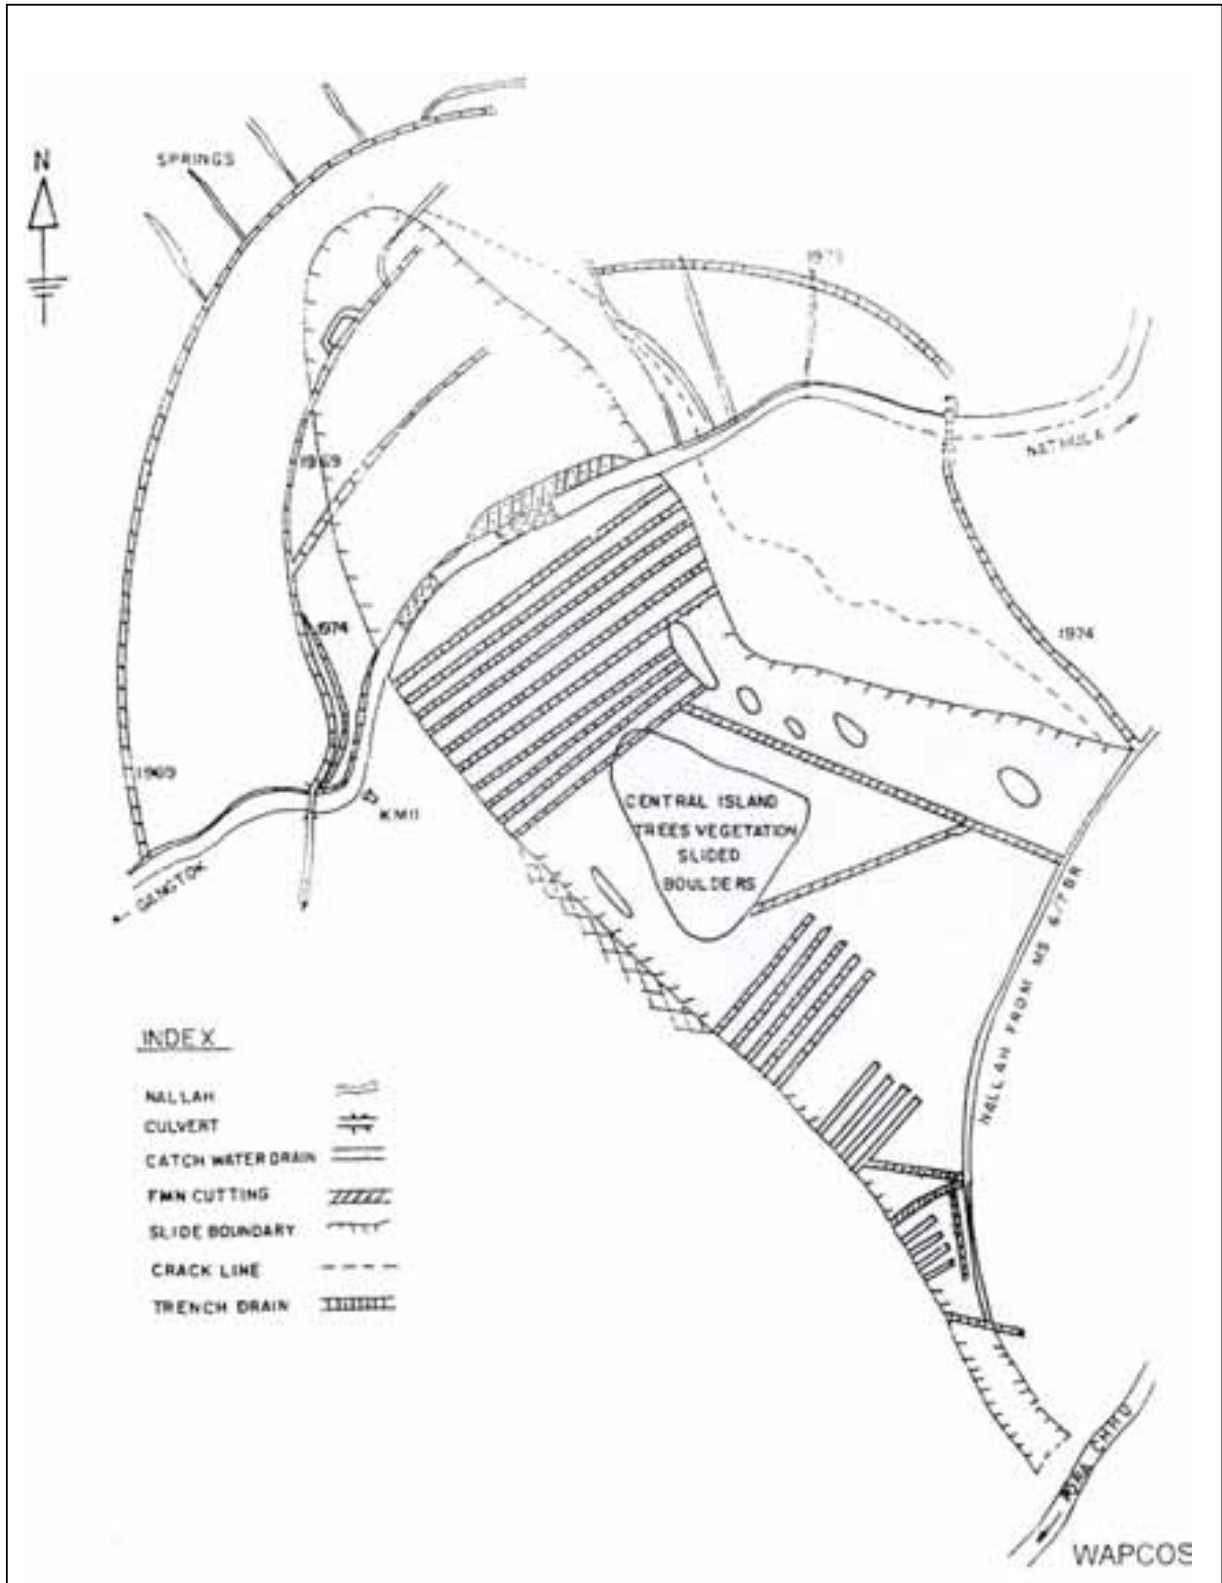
Site plan of 7th mile slide on Gangtok-Kupup road
